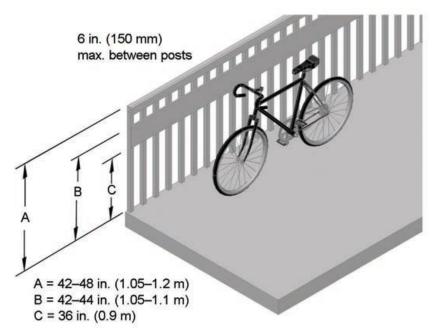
Recommended railing height for trail bridges, along with a rub railing where bicyclists' handlebars may potentially hit railing (Source: AASHTO Guide for Bicycle Facilities)
